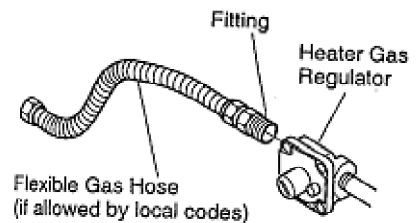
Attaching Flexible Gas Hose to Heater Gas Regulator
